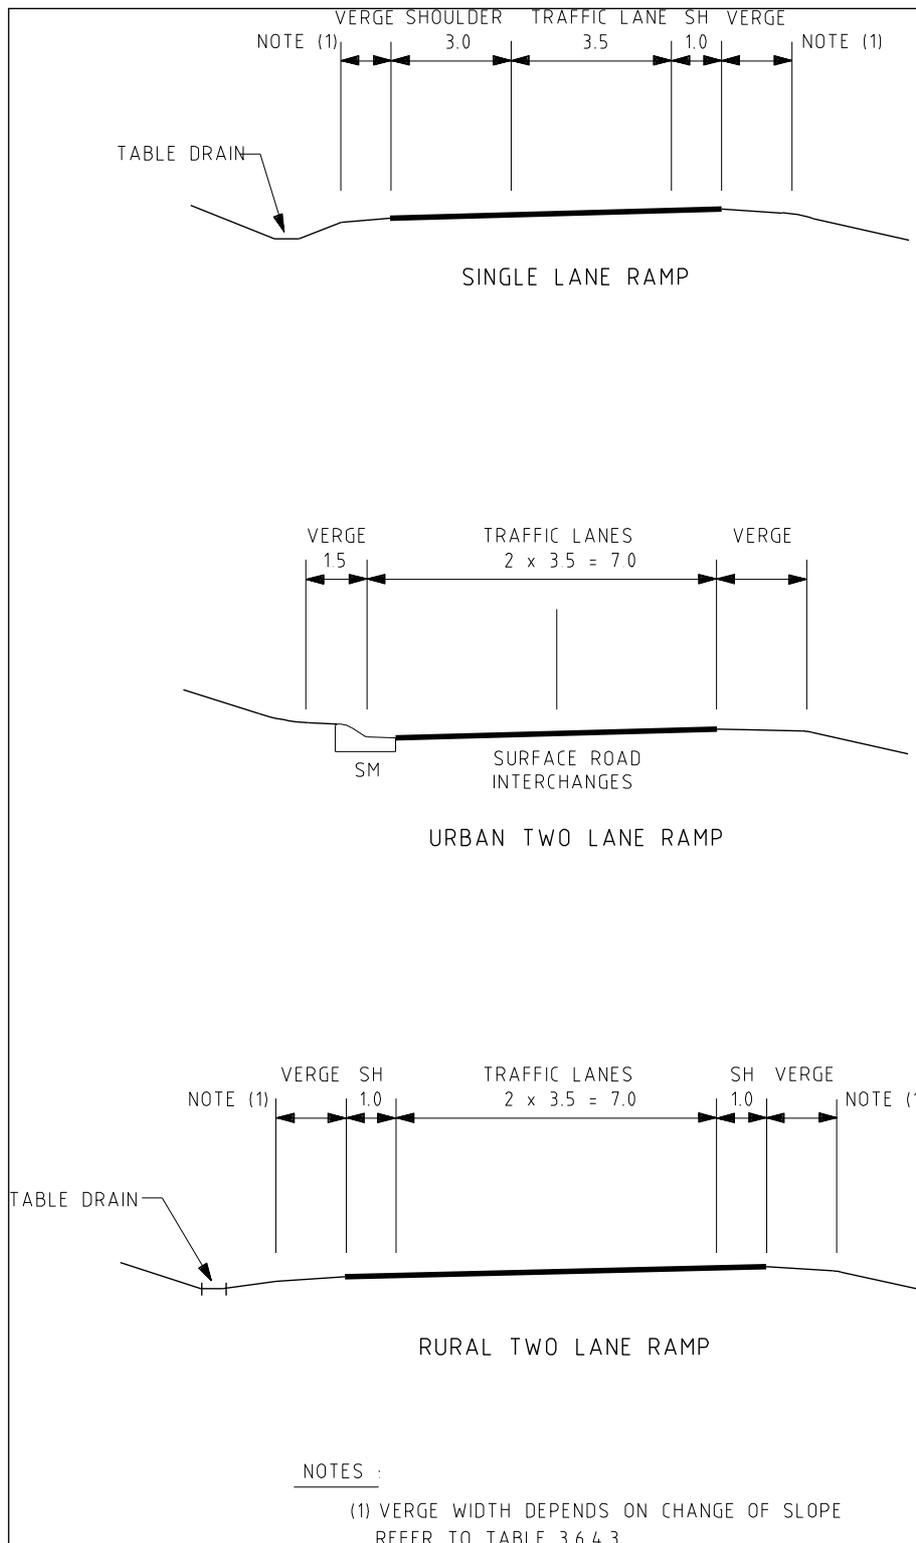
(b): Typical Freeway Ramp Cross Sections Ramps and Loops at Service (Freeway to Surface Road) Interchanges (from RDG Figure 3.14.2(b))
